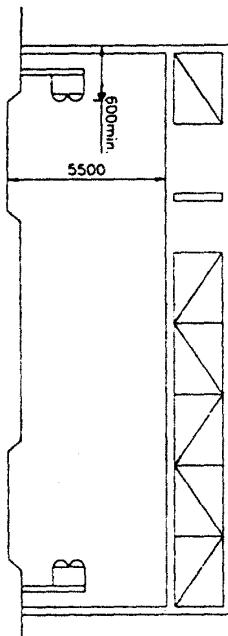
Typical Arrangement of Supports for Overhead Structures
